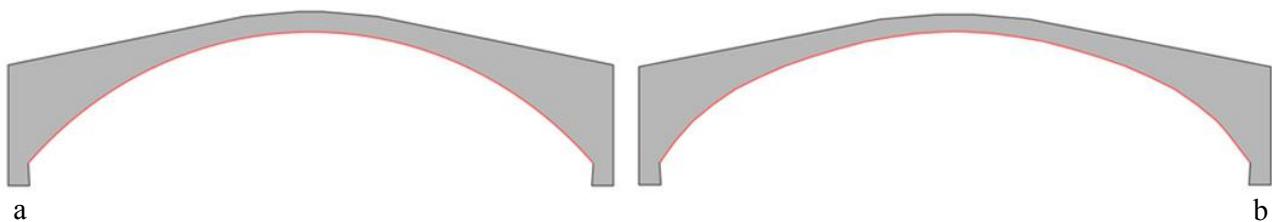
Transversal section shape of the designed bridge (a) and of the actually built bridge (b).
